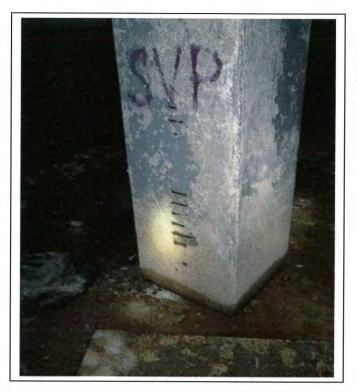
Representative ground-floor structural column. Note that the concrete has spalled exposing the rebar. (October 22, 2014)
